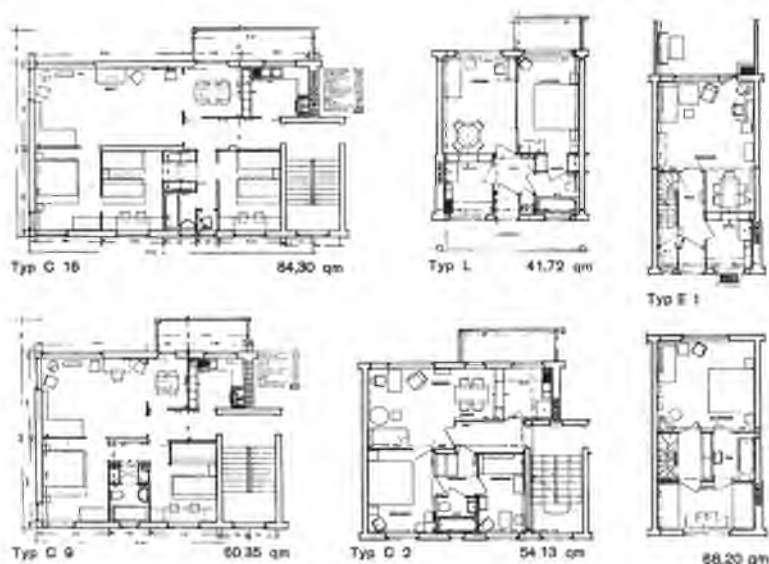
Alexander Klein, typical apartment plans from 68 to 84 sm
